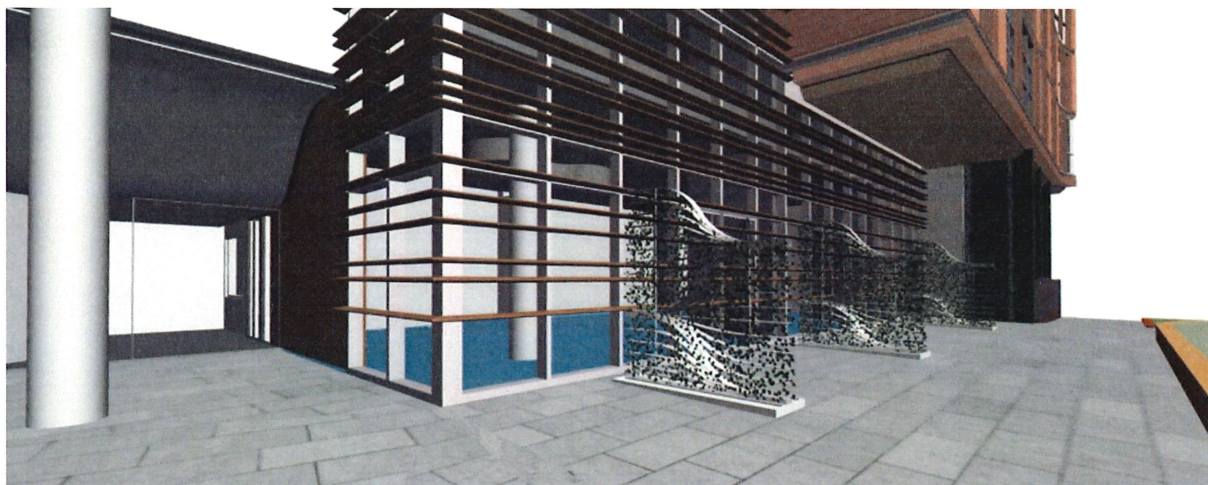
Perspective of proposed vertical screens with climbing plants (Source: Applicant's RtS)
